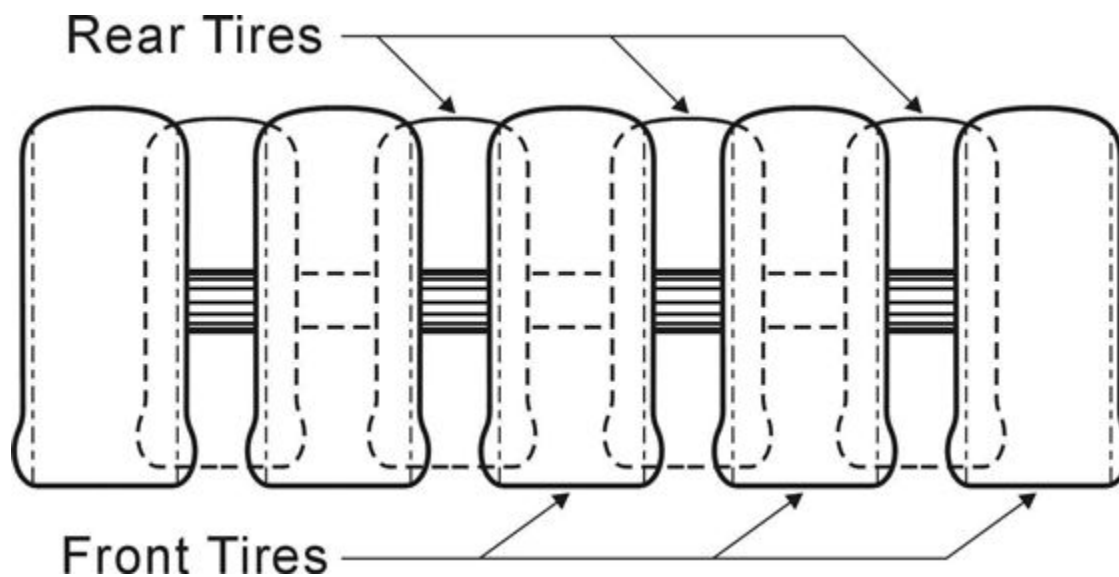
Wheel Configuration on Pneumatic Rollers.
